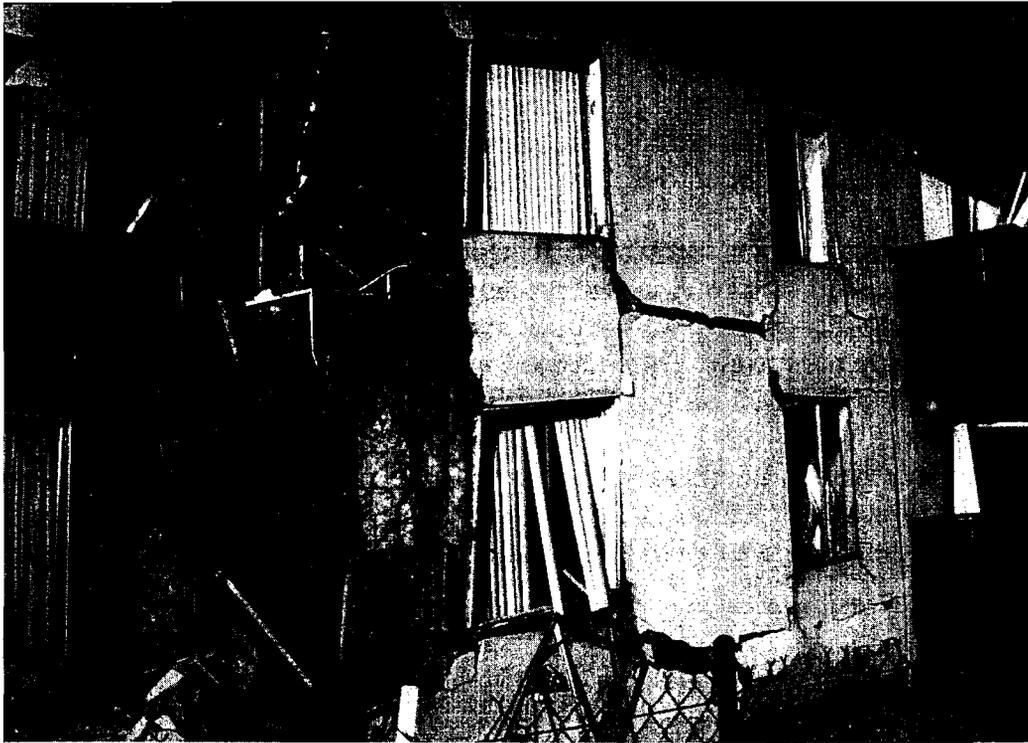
Structural damage at Northridge Meadows Apartments, where the top two floors collapsed, killing 16 people.
